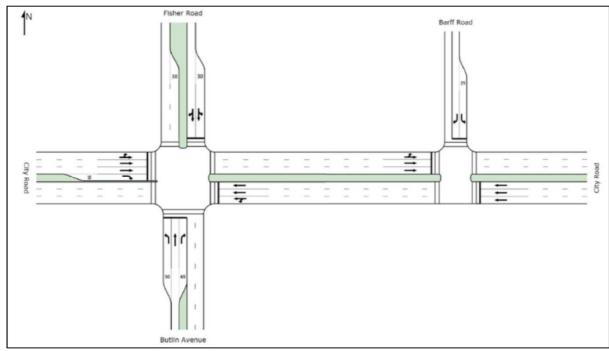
Existing City Road/Butlin Avenue/Campus Intersection Layout (source: Applicant)
